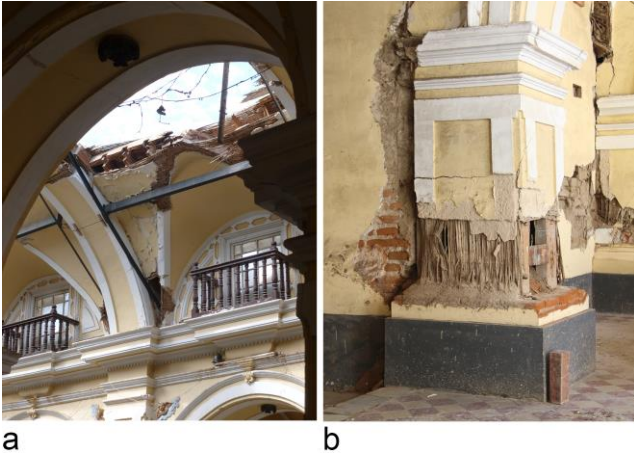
Damage observed in-situ in a representative bay: a failure of timber connections, b rocking motion of the pilasters
